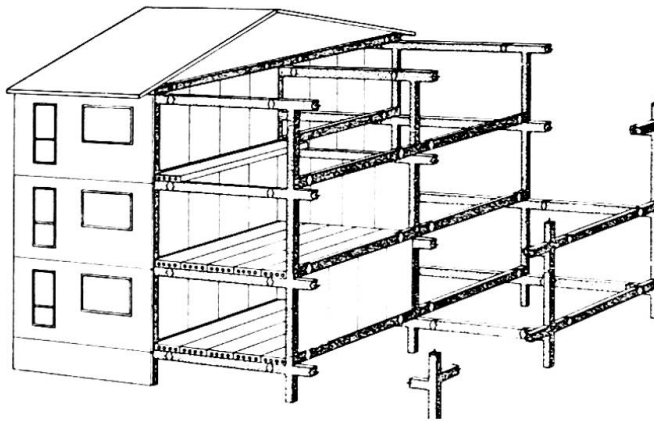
A frame house built of concrete elements, showing the joints. The frame is built up of comparatively small elements.
